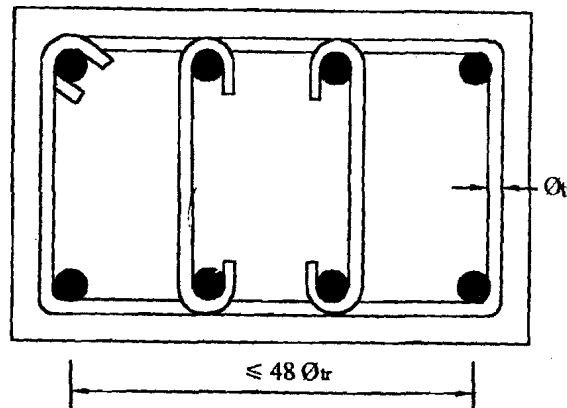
Transverse Reinforcement as per Section 14.4.3 a(ii)
